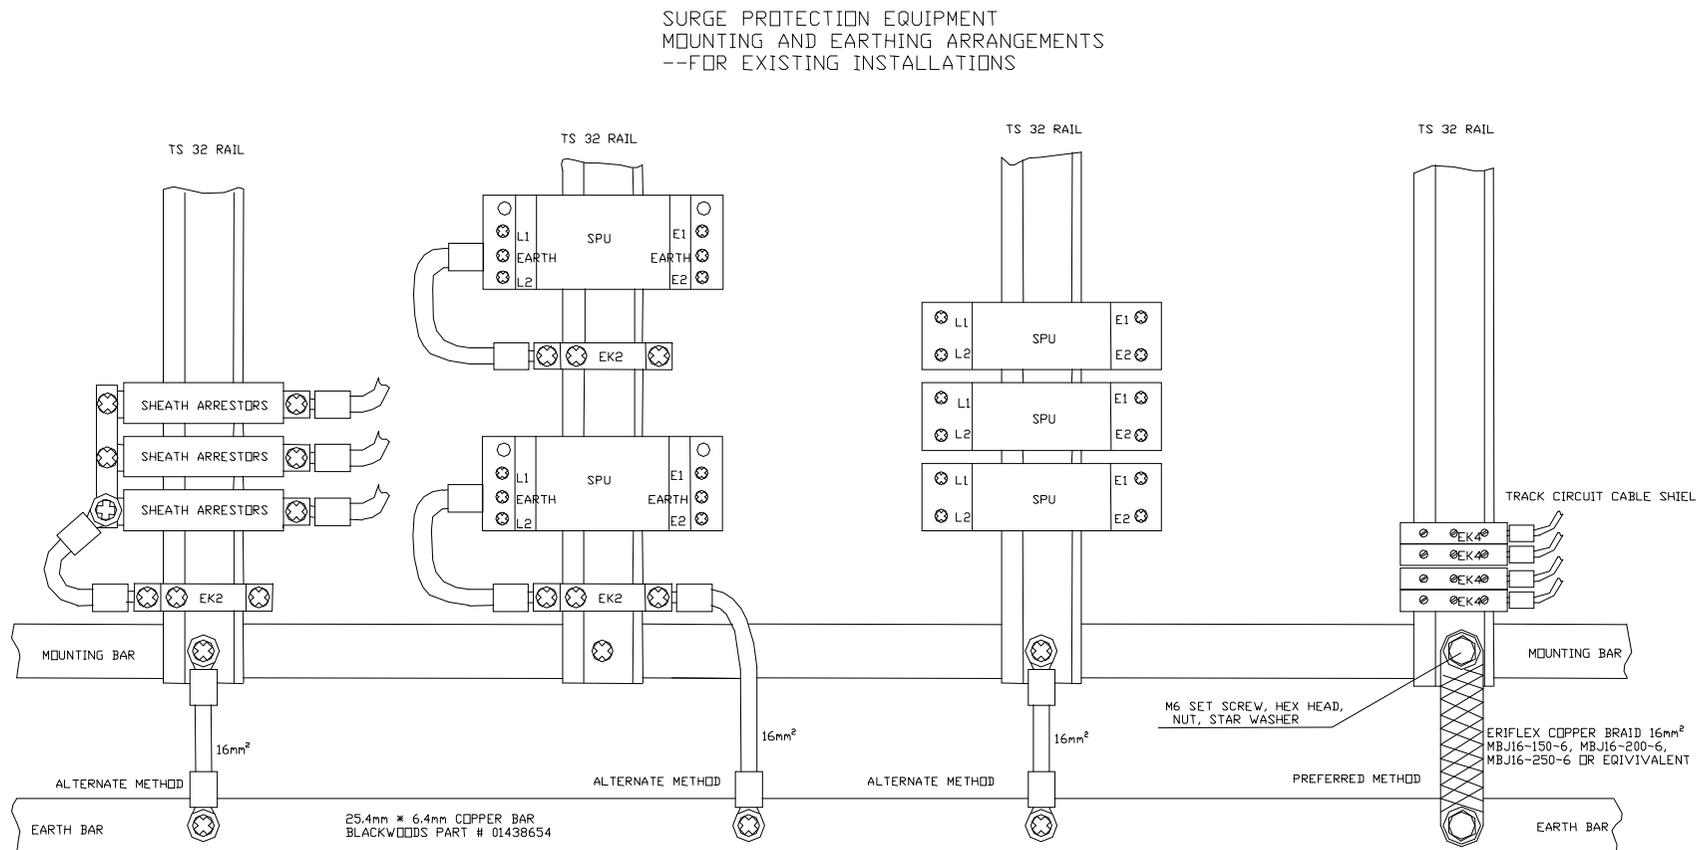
Showing the methods for retrofitting improved earthing practice into existing location cases.
